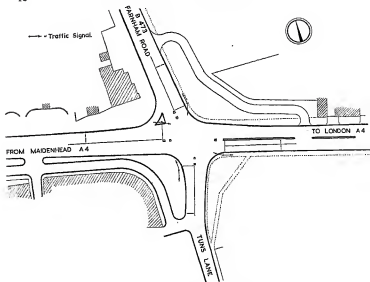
"Three Tuns" crossroads BEFORE improvement
